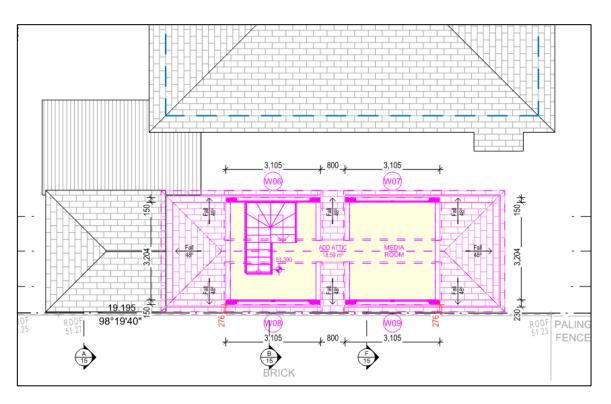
Proposed Attic Floor Plan (Source: Gardner Design & Drafting).
